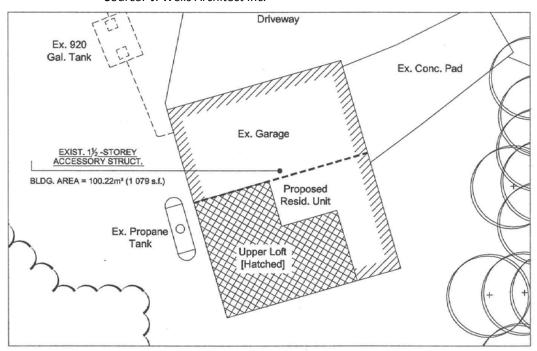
Accessory Structure Detail Source: J. Wells Architect Inc.
